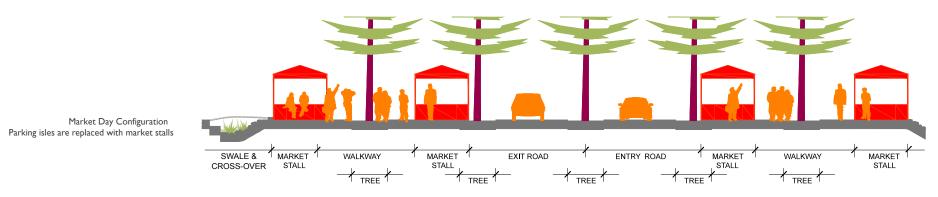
| Indicative cross section through Pier Park space showing possible market activities
